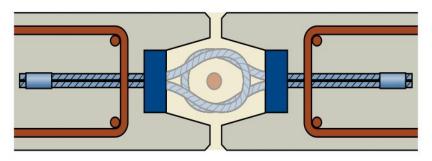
Cable loop connection between two precast walls Source: Pfeifer Seil- und Hebetechnik GmbH, Memmingen
